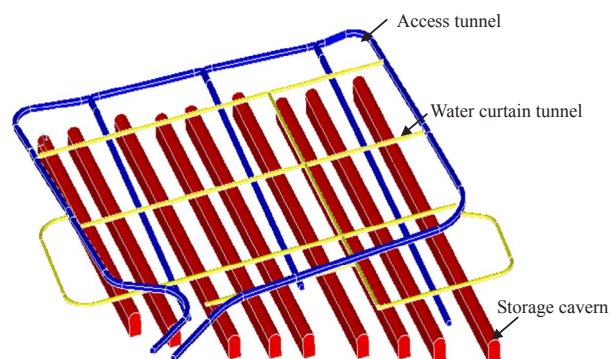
Layout of underground structures of the pilot underground oil storage facility.
